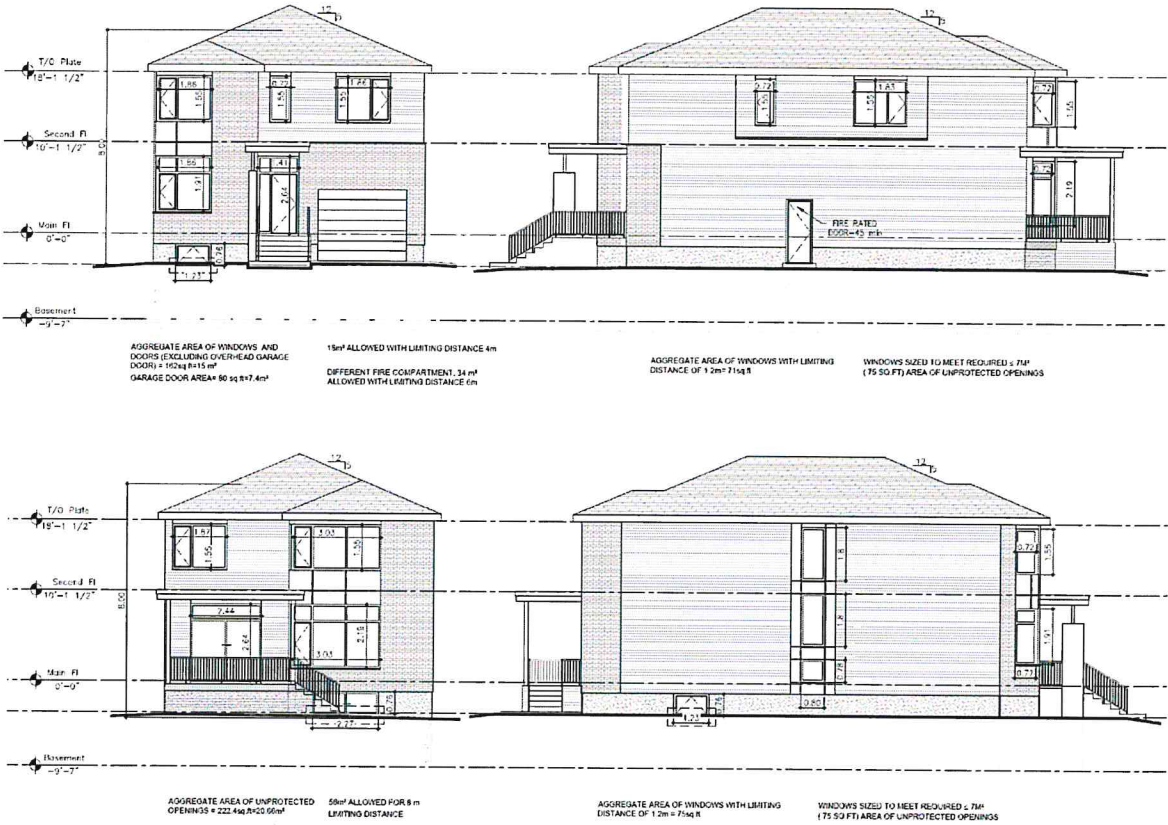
Front Elevation (top left), Side Elevations (top and bottom right), Rear Elevation (bottom left) (Source: Simmonds Architecture)
